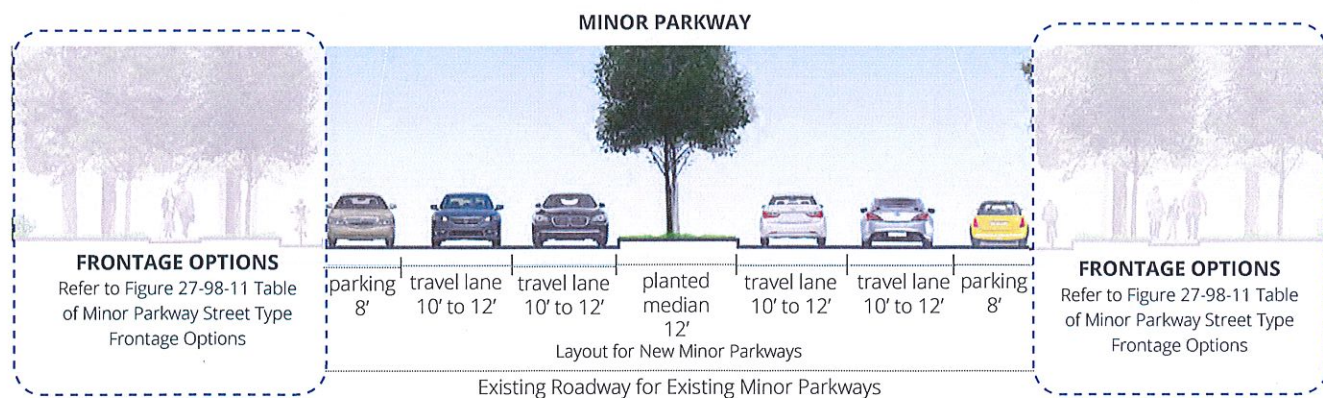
Minor Parkway Street Section - Existing and New
